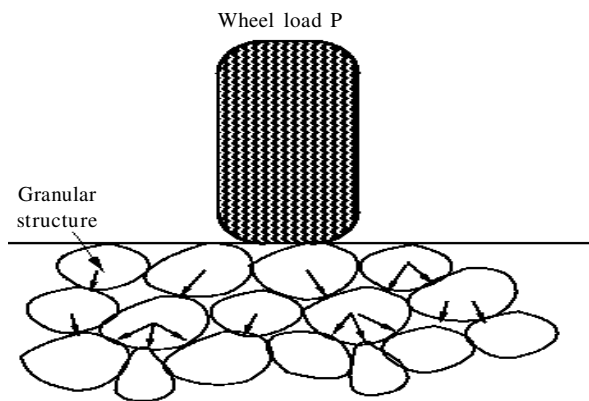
Vertical compressive stresses on pavement surface under the wheel load
